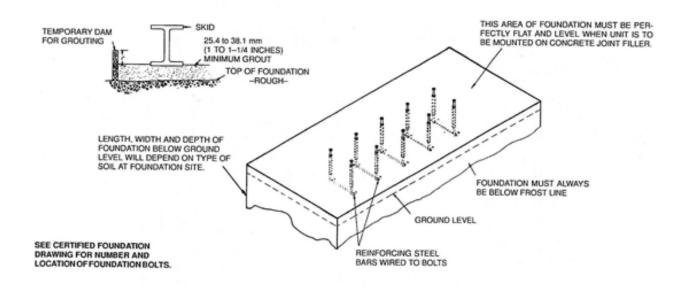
TYPICAL FOUNDATION WHEN COMPRESSOR IS MOUNTED ON A STEEL BASE OR SKID
